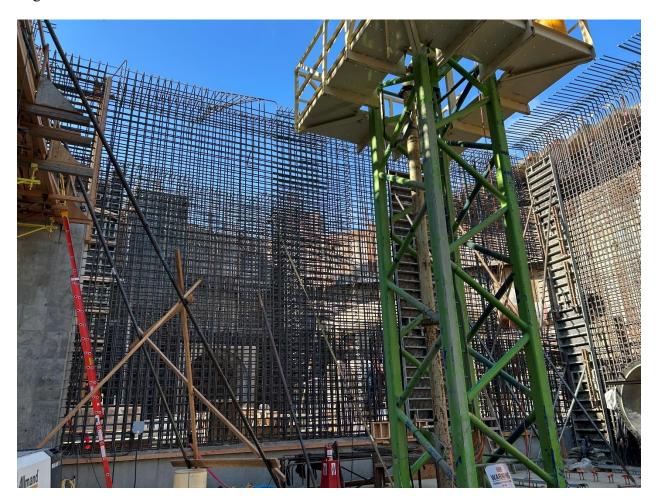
Reinforcing steel for the divider wall between the UV Room and Effluent Weir Structure prior to installation of formwork.
